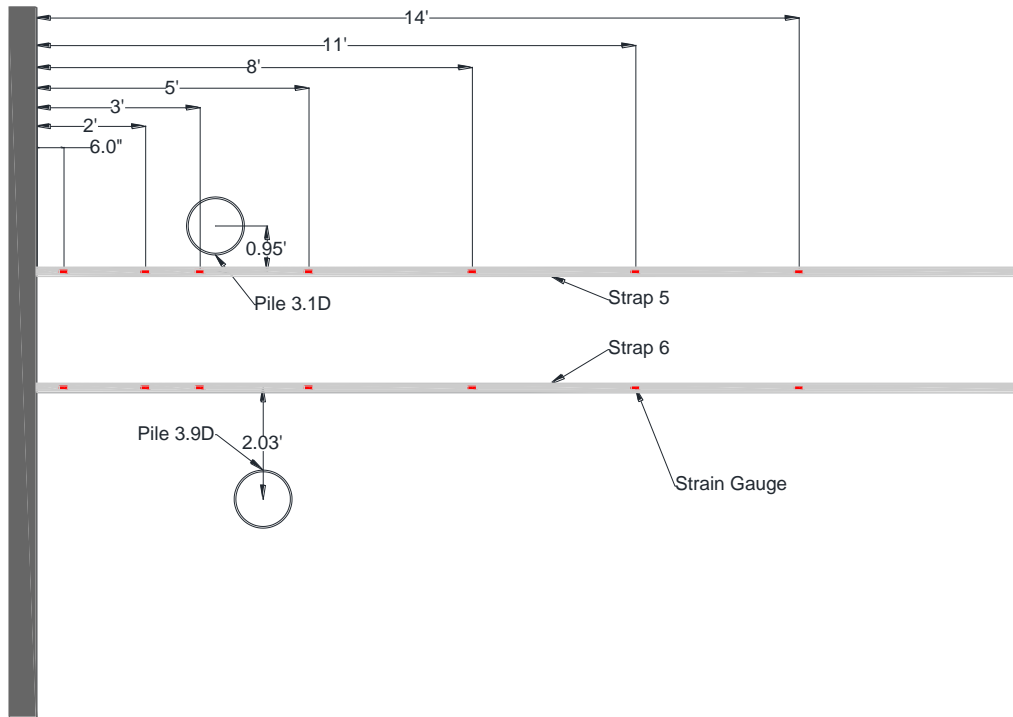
Plan view of the top layer of reinforcement for piles at 3.1D and 3.9D.
